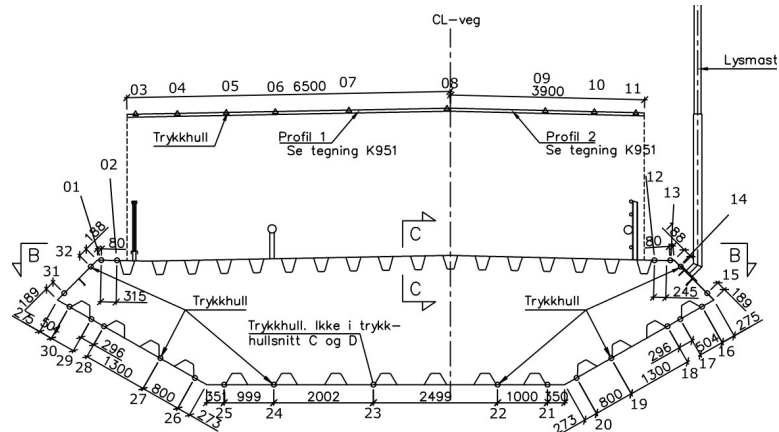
Cross section of the bridge girder and surface pressure tap locations shown by numbers from 01 to 32.
